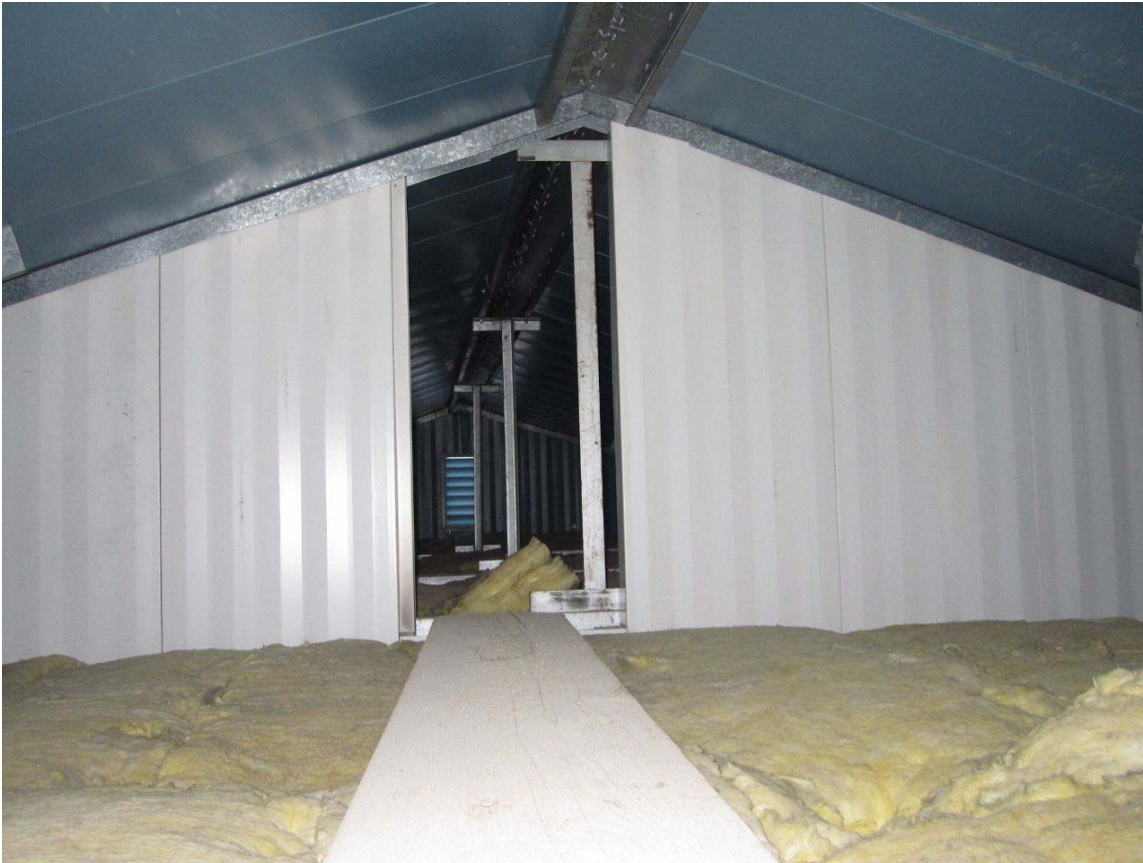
Existing Roof Insulation Thickness (Kingfisher Lake)
